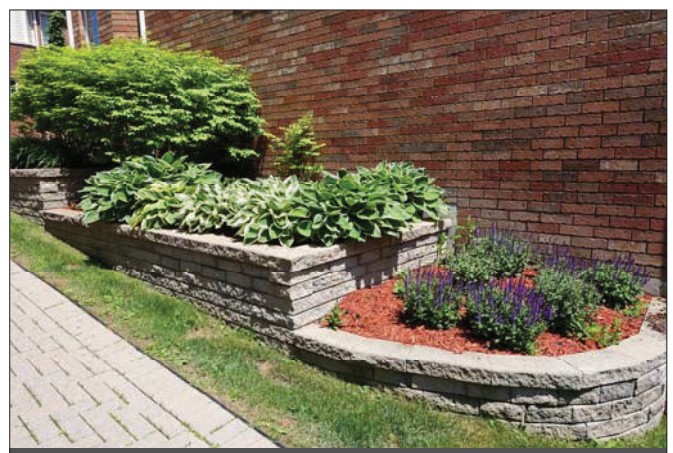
Landscape retaining walls should not be higher than 0.6 m
